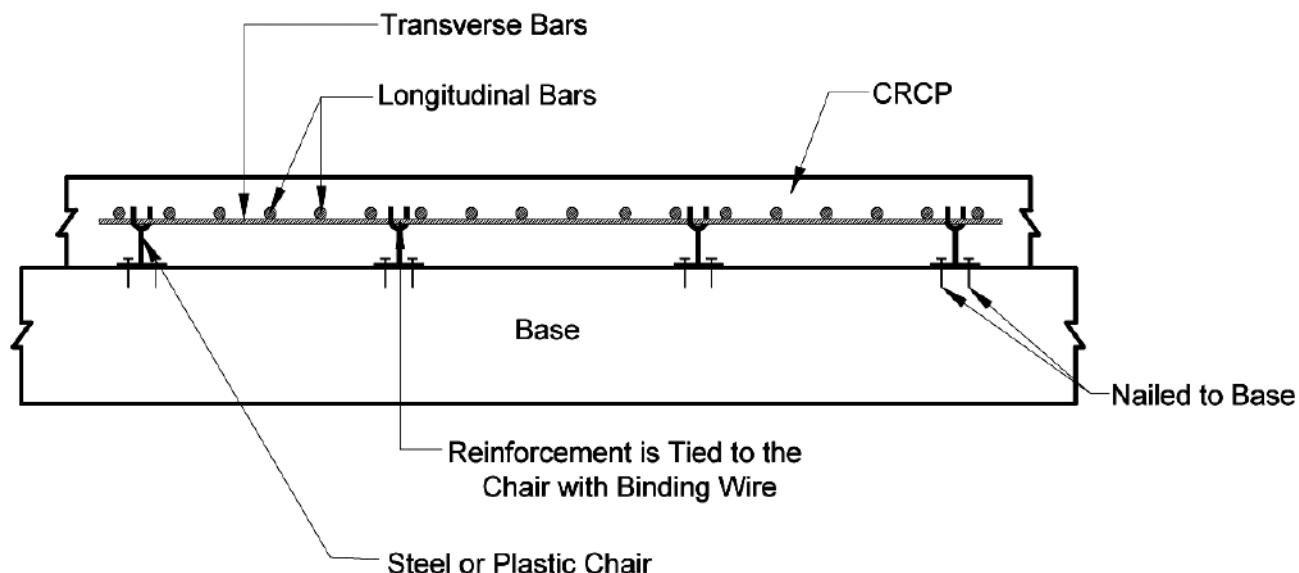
Steel or Plastic Chairs used for Installing Steel Reinforcement in CRCP
